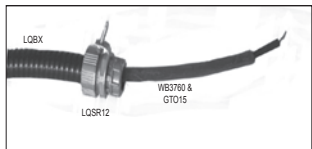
Slide USSB over WB3760 and GTO cable.. If necessary, Slide support ring over assembly and use metallic self tapping screw to hold assembly in place on wall or ceiling.
